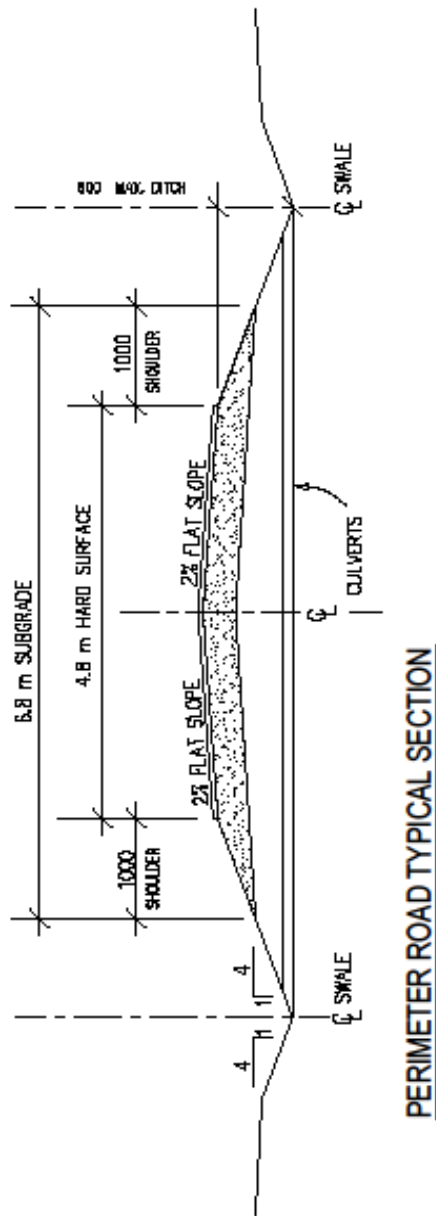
SECTION THROUGH FENCE AND ROAD
